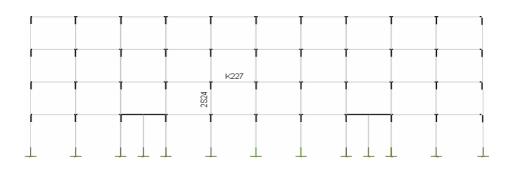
Frame C, Rigid End Zones, Example Column and Beam
